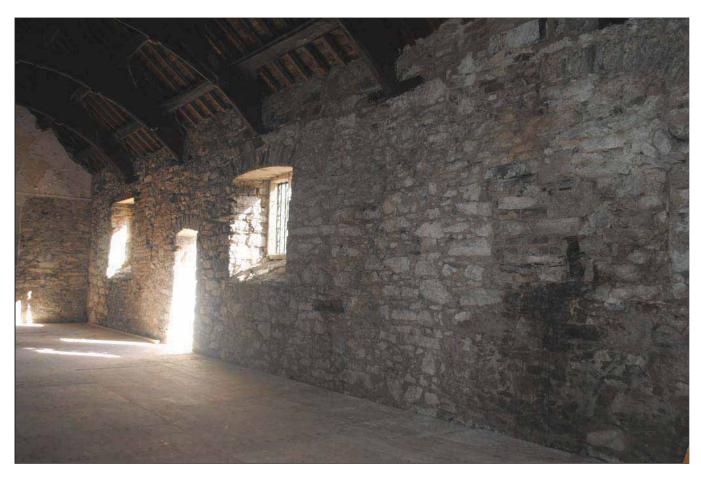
Old Grammar School internal - West Facing Internal elevation of the School Hall
